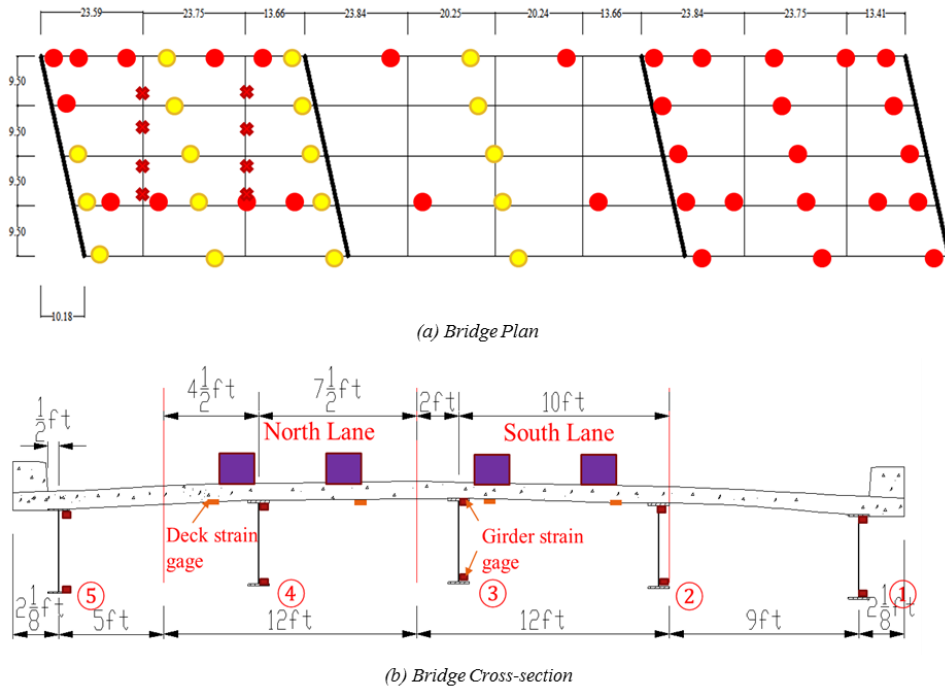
I-80 Bridge, Instrumentation Plan Deck Gauges
